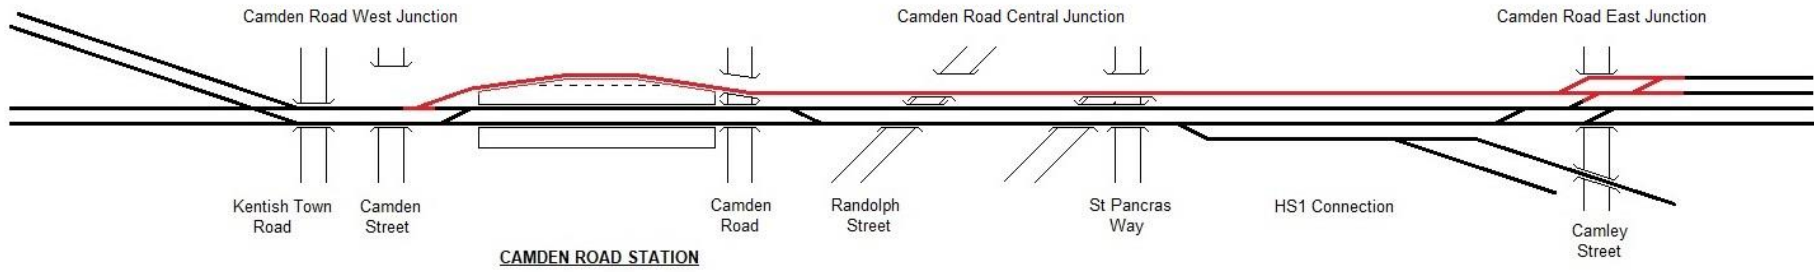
Schematic drawing of proposed Camden Road Platform 3 scheme
